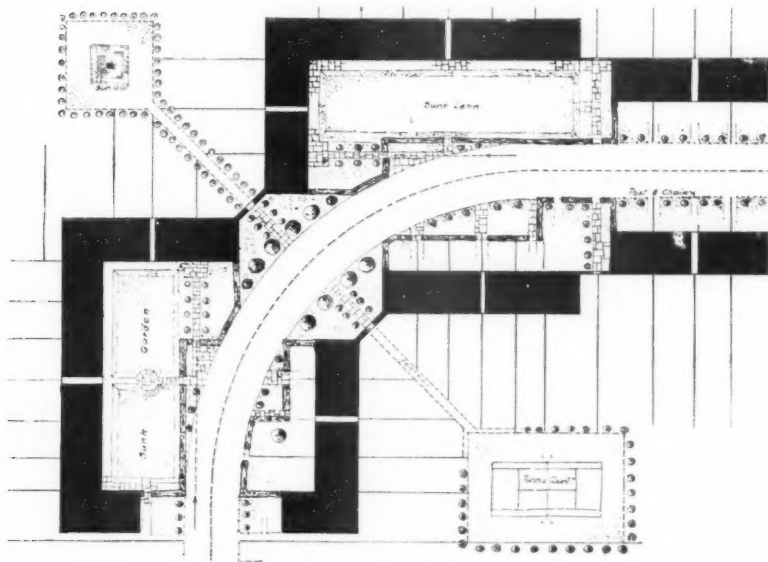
GROUPS OF BUILDINGS DESIGNED TO MAINTAIN SQUARE ROOF LINES ON A CURVING ROAD.
